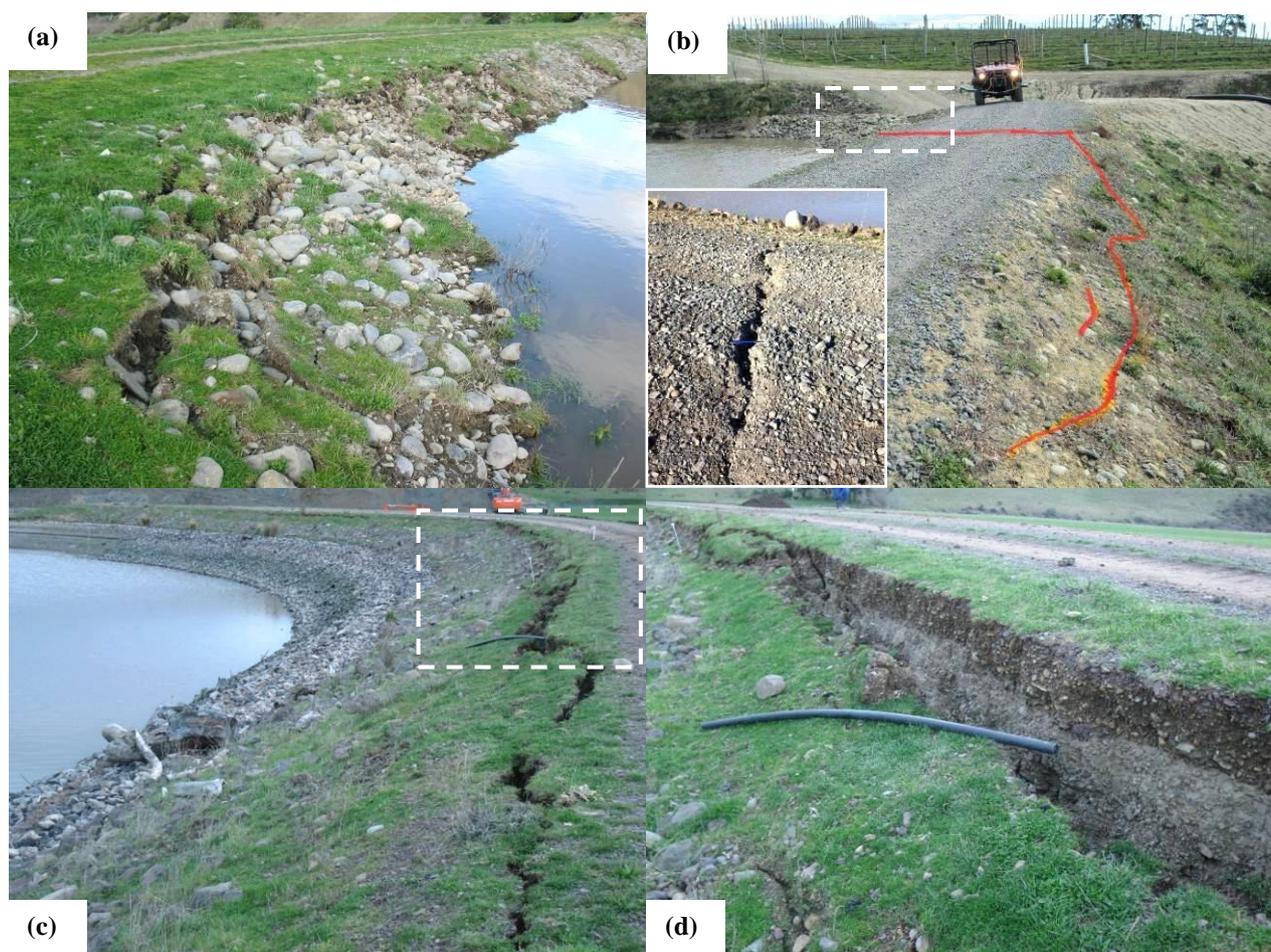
Various damage observations to water storage dams: (a) movement of riprap on the upstream shoulder of Dam A; (b) longitudinal and transverse crack (inset) to the crest of Dam I; (c)-(d) extensive damage at Dam E included longitudinal cracking to the full crest length.
